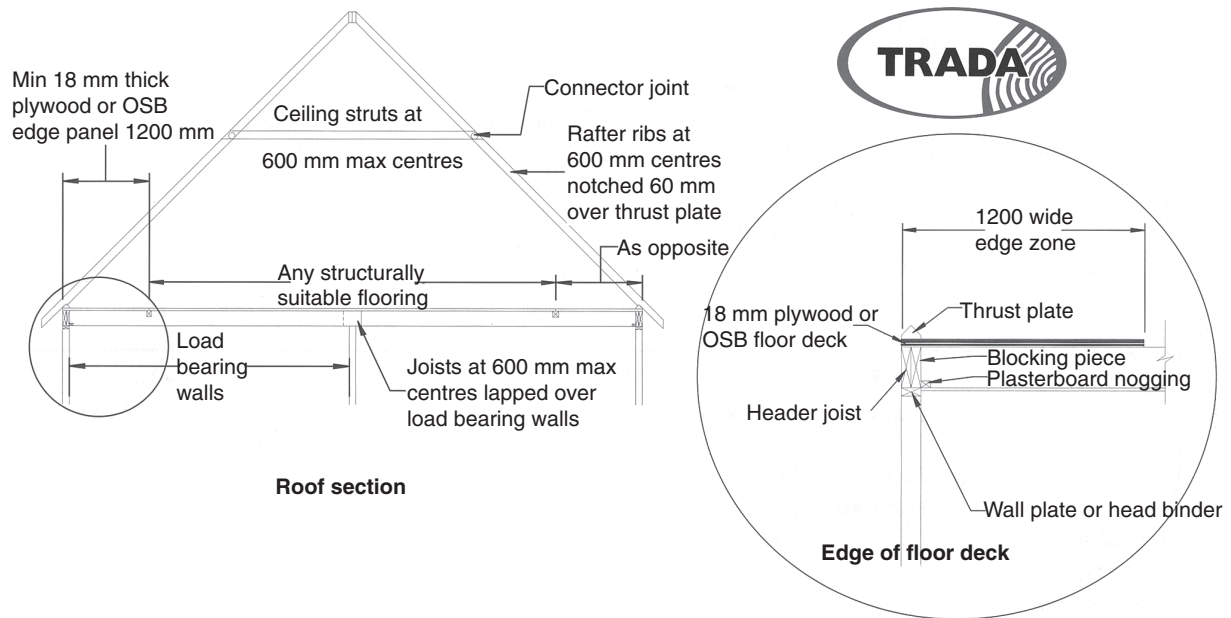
Configuration and edge detail for sheathed roof panel construction.
